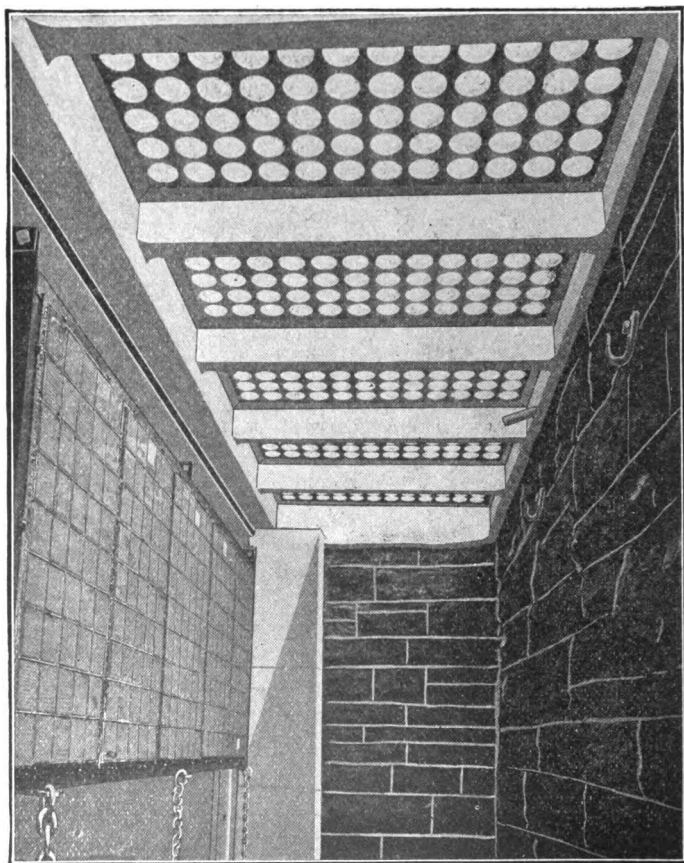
View of Reinforced Concrete Side-walk Lights from below.
